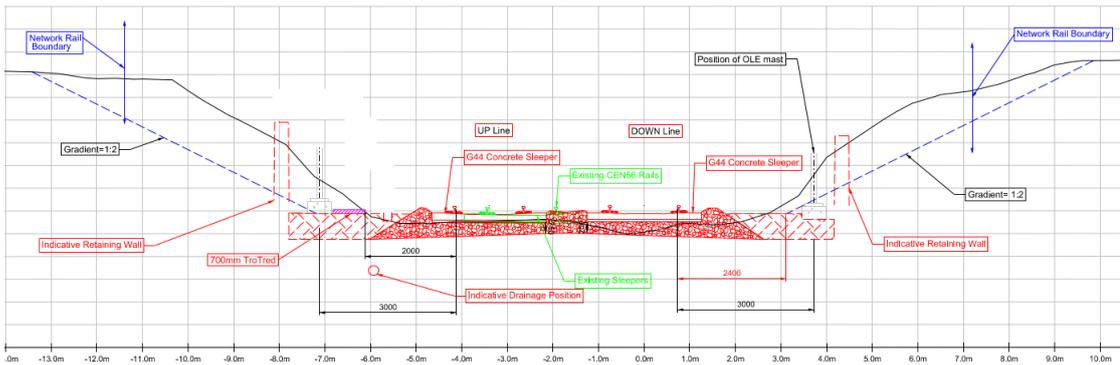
Proposed Earthworks Cross Section at chainage 6400m
